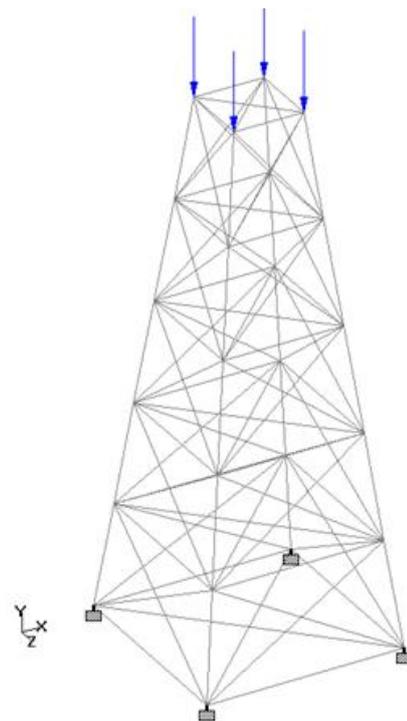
3-Dimensional STAAD model of Jacket structure with deck load
